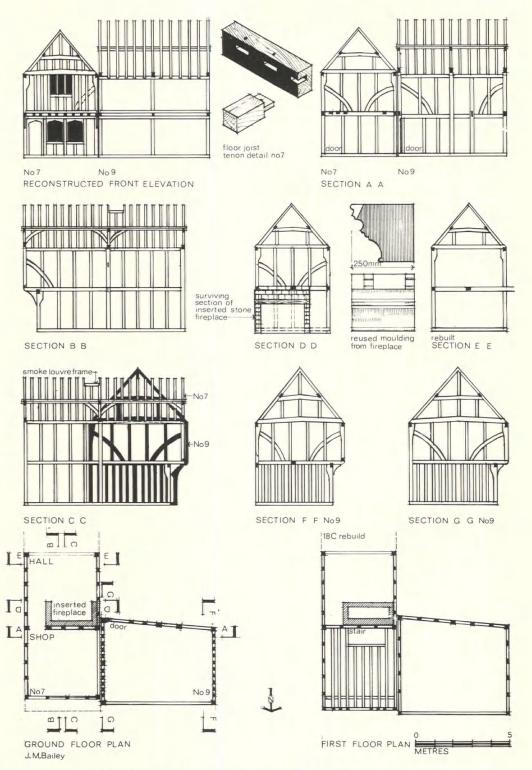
Plans and Sections of nos 7 and 9 West Street, Dunstable.
